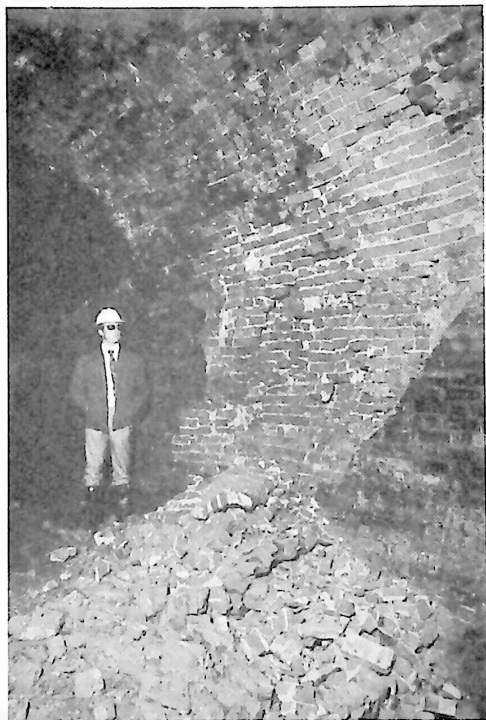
Brick fall on west face at ch.243 — 10 June 1974
